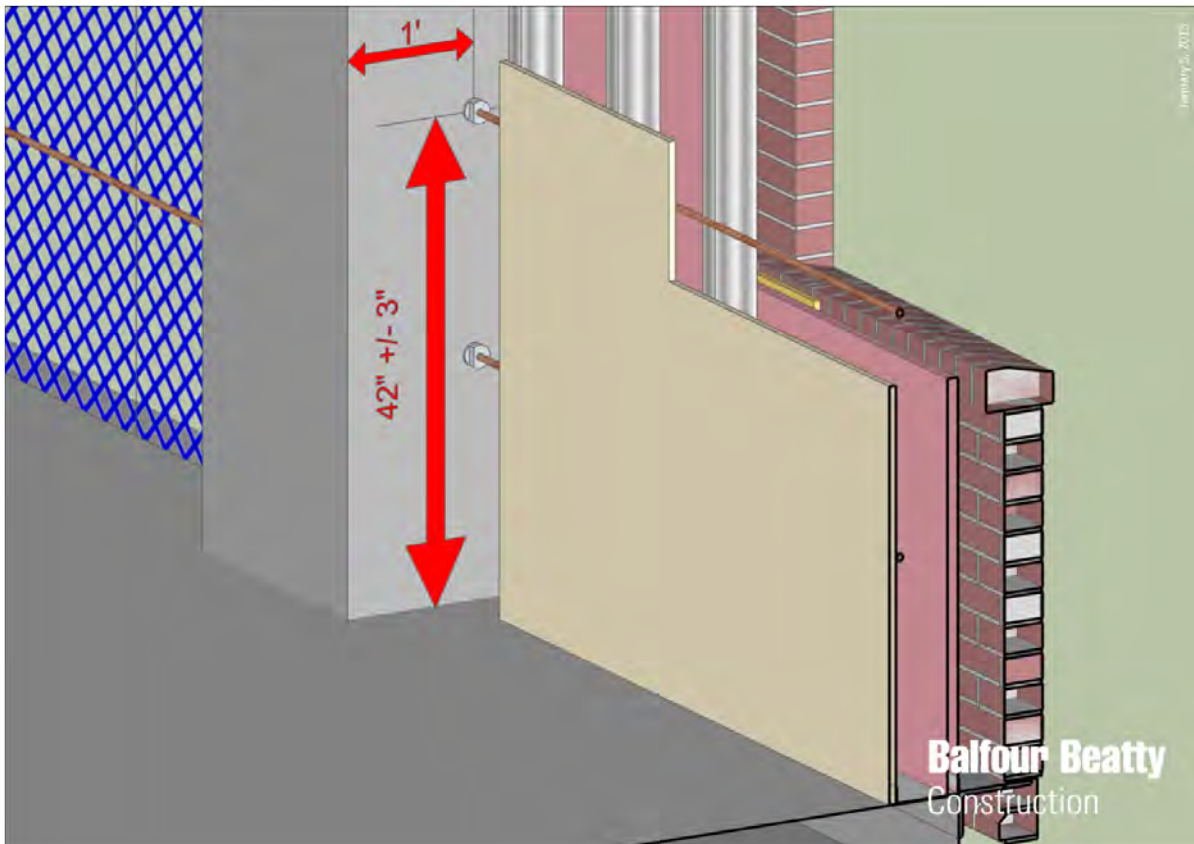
Perimeter cable guardrail clash with exterior wall skin removed using BIM (Picture Courtesy Balfour Beatty Construction)
